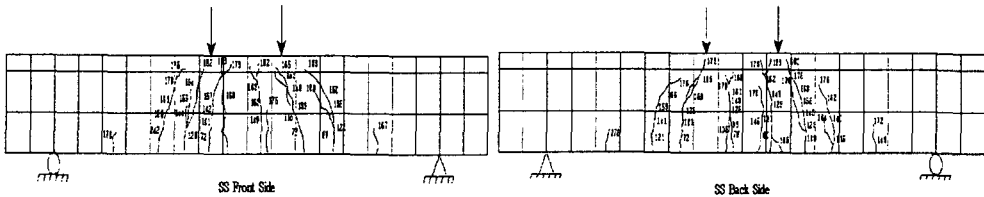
Crack patterns of recycled PET polymer concrete beams
